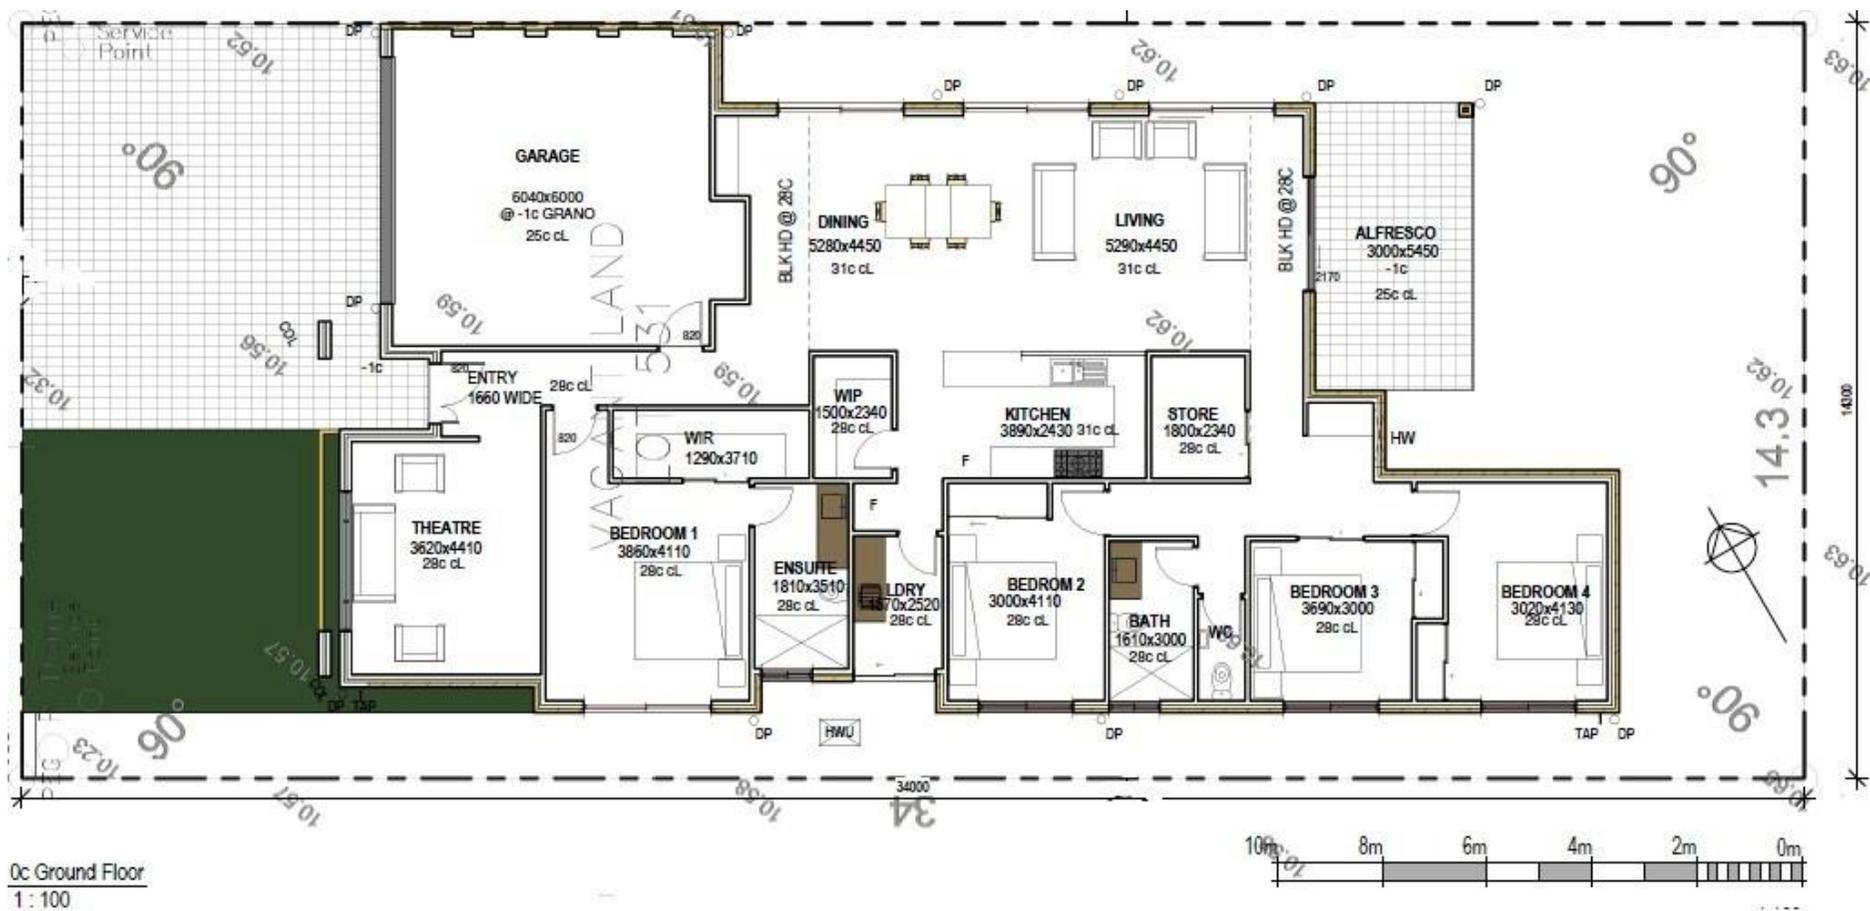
Plan of a typical 4x2x2 detached house in Perth (Source: Fozdar Technologies Pty Ltd.)
